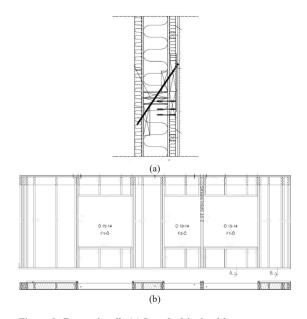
External wall: (a) Detail of the load-bearing section of a timber-framed wall, (b) Front view of one of the lightweight timber frame panels.
